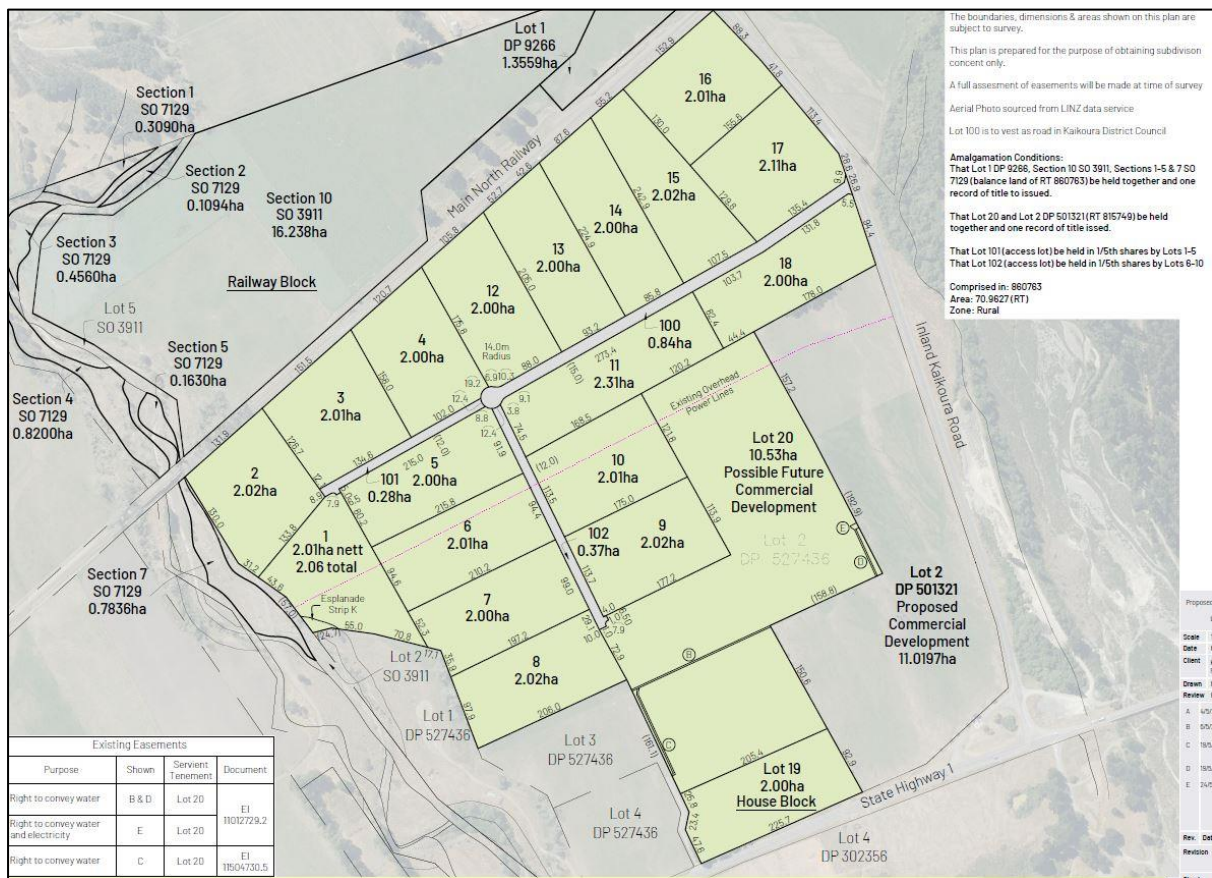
Plan showing the proposed layout of the Kowhai Downs Lifestyle Block subdivision to be formed out of Lot 2 DP 527436. Image: Baseline Group Ltd.
